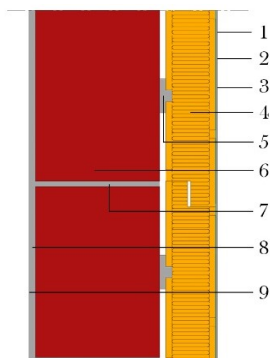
Structure of an exterior façade wall using Adingsystem¹
